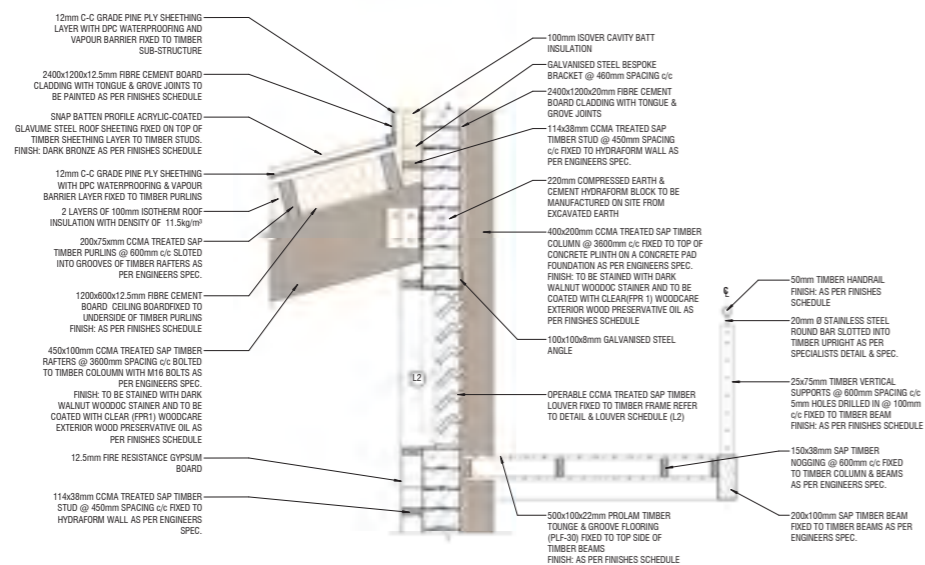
Suspended Floor & Roof Junction Detail (#4)
